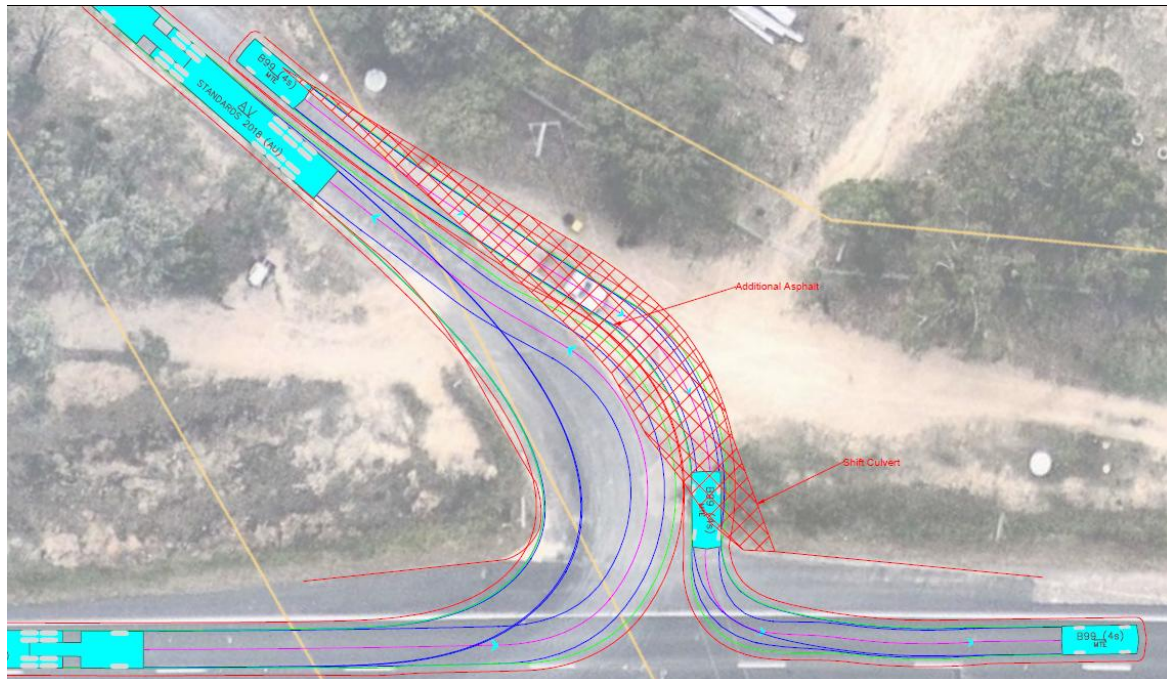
Proposed widening Coral Park Road - Princes Highway intersection
